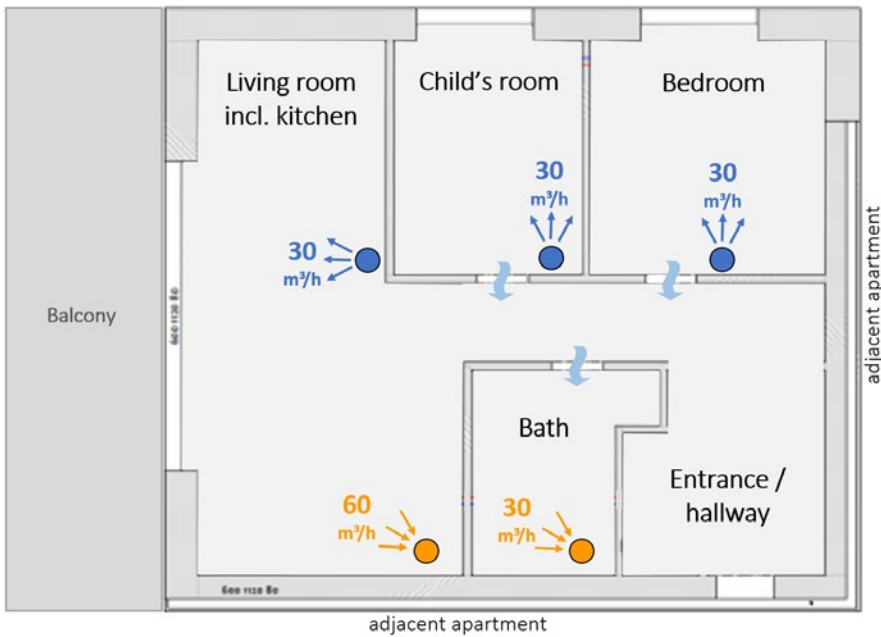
Sketch of the simulated floor plan representing a typical new Austrian residential dwelling.
